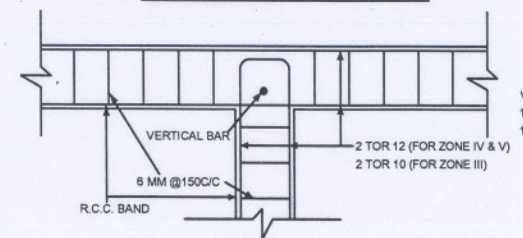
DETAIL - A (ISOMETRIC VIEW) DETAIL OF BAND AT ENDS (C)
